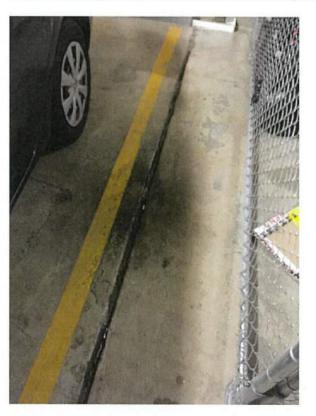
Moisture on surface of slab at construction joint between the B1 floor slab of buildings A and B. Photo taken immediately below location of photo 5.
